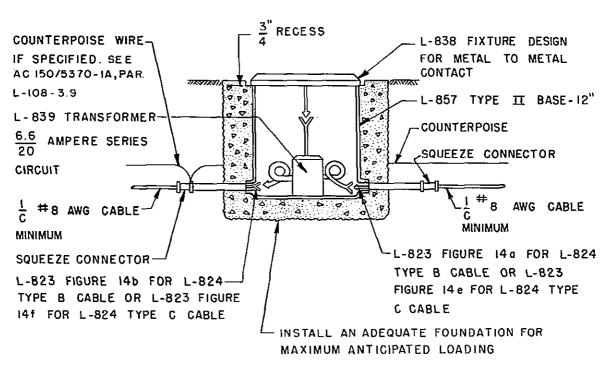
TYPICAL FIXTURE, TRANSFORMER AND BASE INSTALLATION DETAILS
